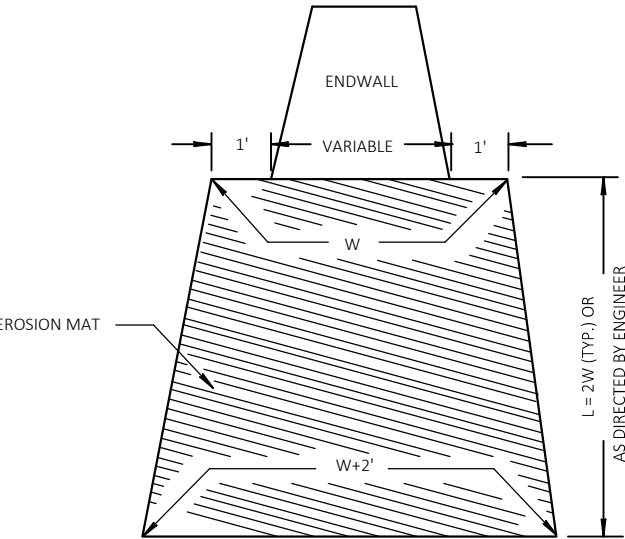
DETAIL FOR CTH M CULVERT PIPE REMOVAL, REPLACEMENT AND BASE PATCHING INSTALLATION
